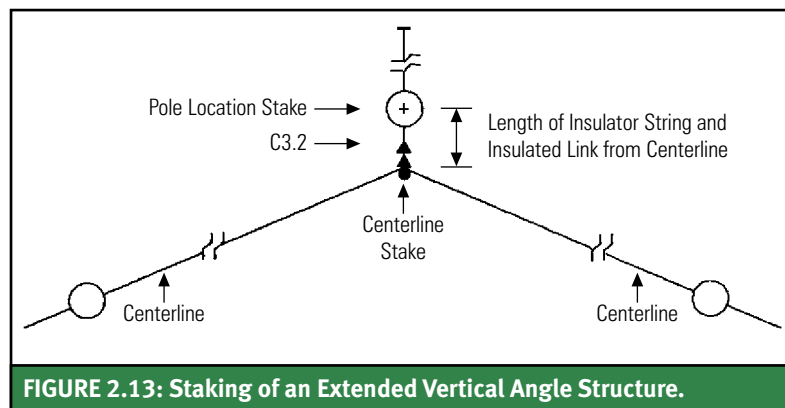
Staking of an Extended Vertical Angle Structure.
